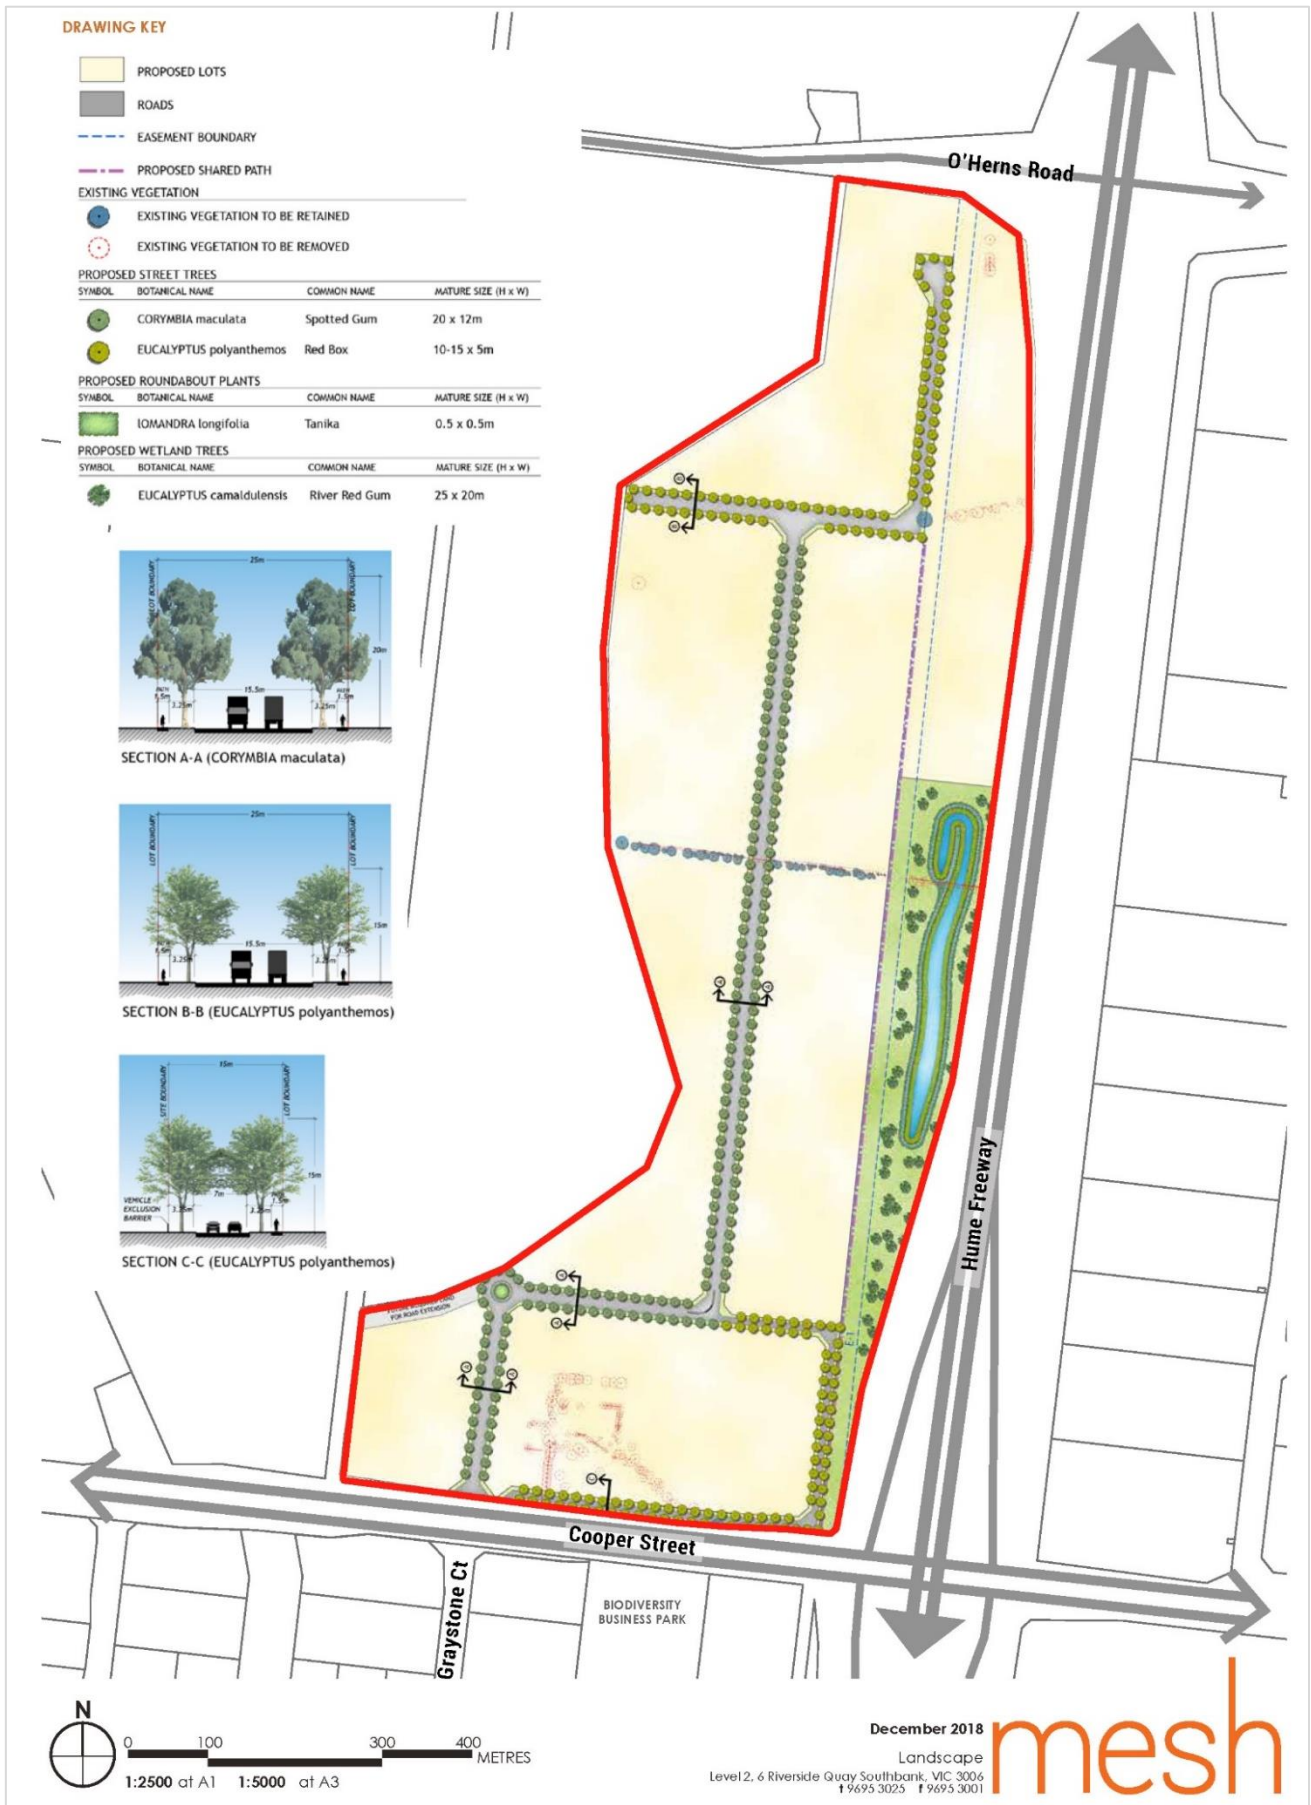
Landscape Concept Plan (internal roads to be approved at subdivision stage and will be consistent with development plan)
